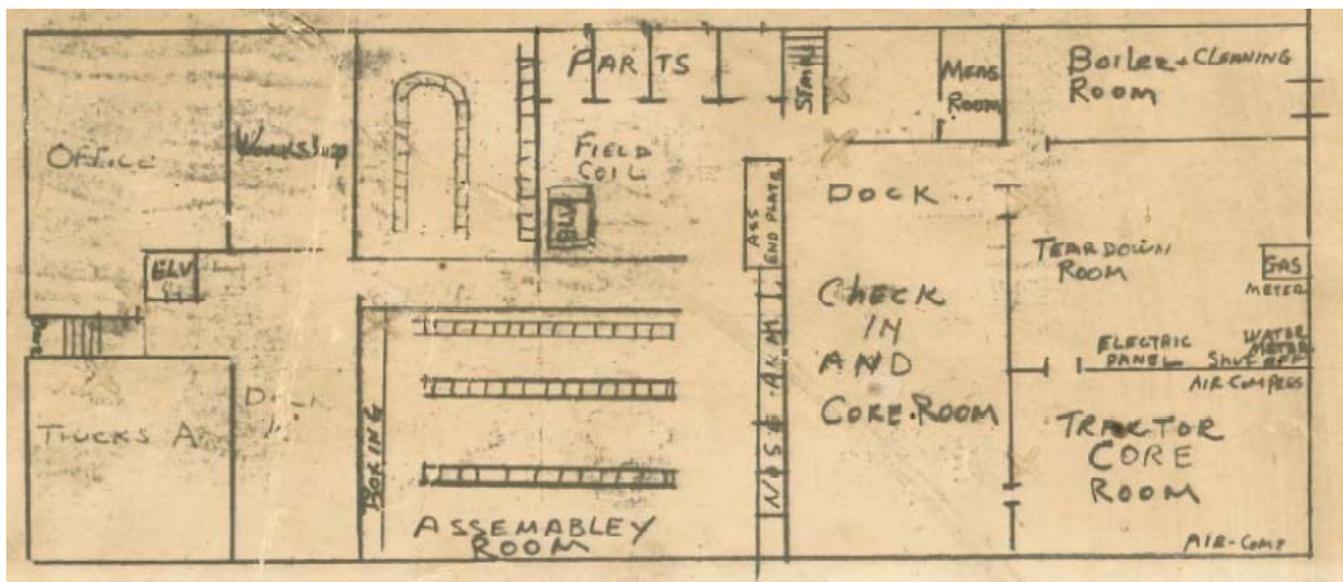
First Floor Plan of 315 West 12th Street. The drawing was found at the site. Front of the building is at the left.
